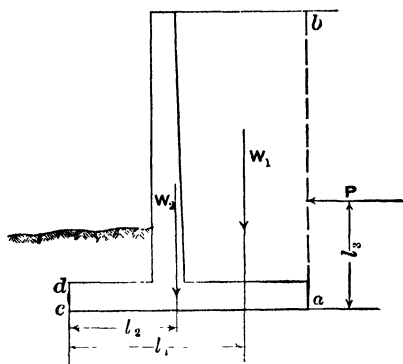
Forces Acting upon a Retaining Wall and their Moment Arms. (See p. 761)
